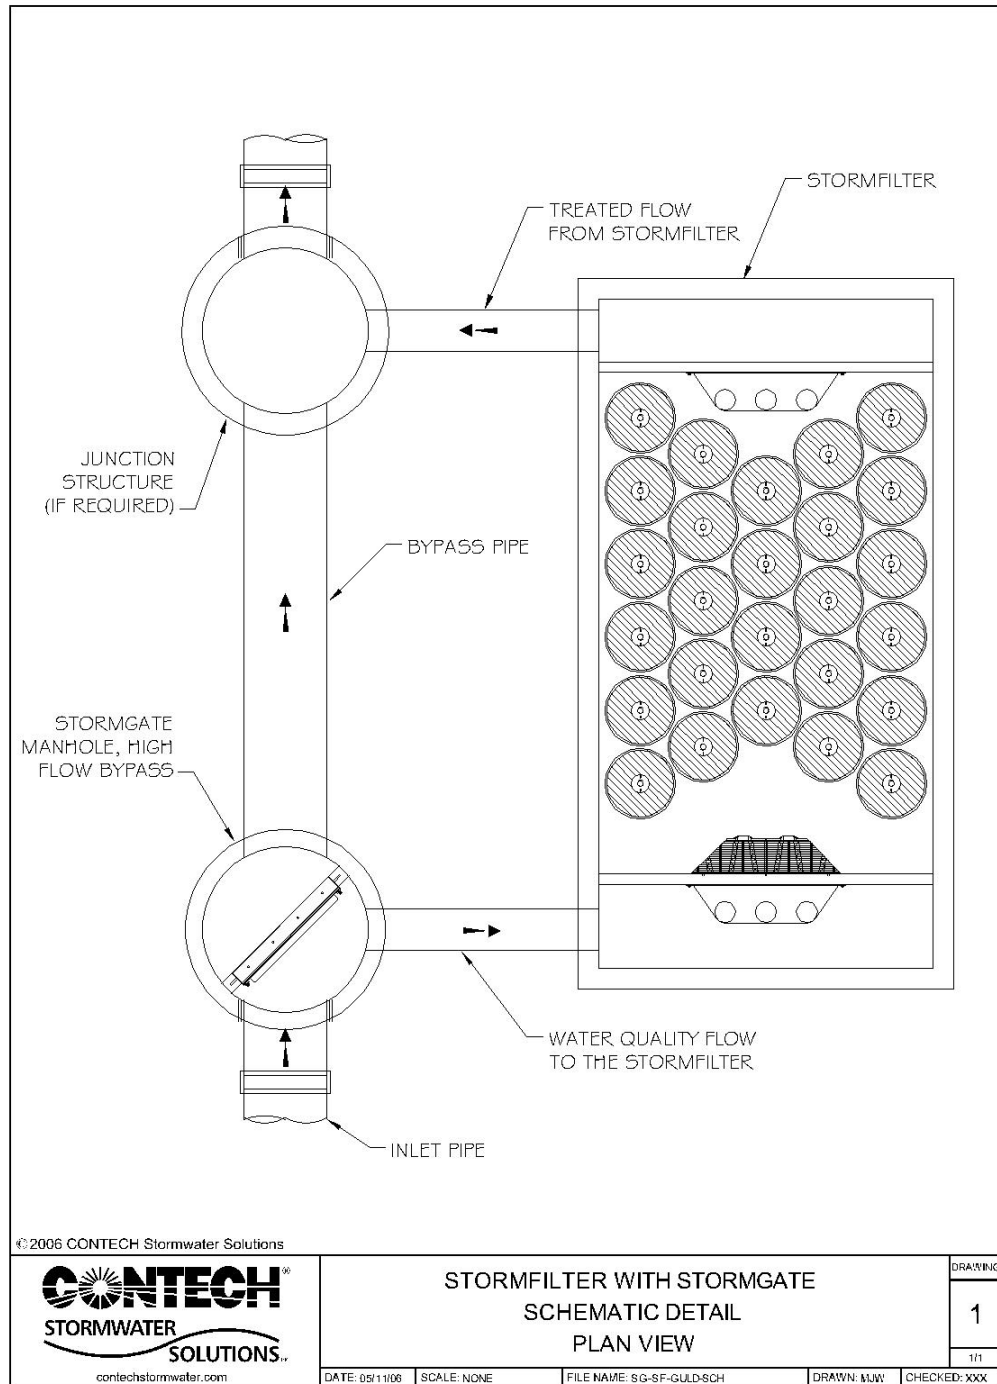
Stormwater Management StormFilter Configuration with Bypass
